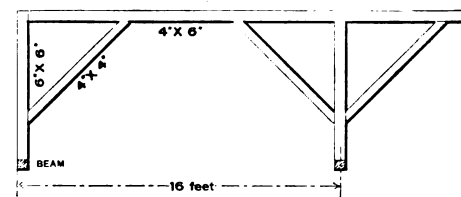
Sectional View, Showing Purlin Plate and Posts.
